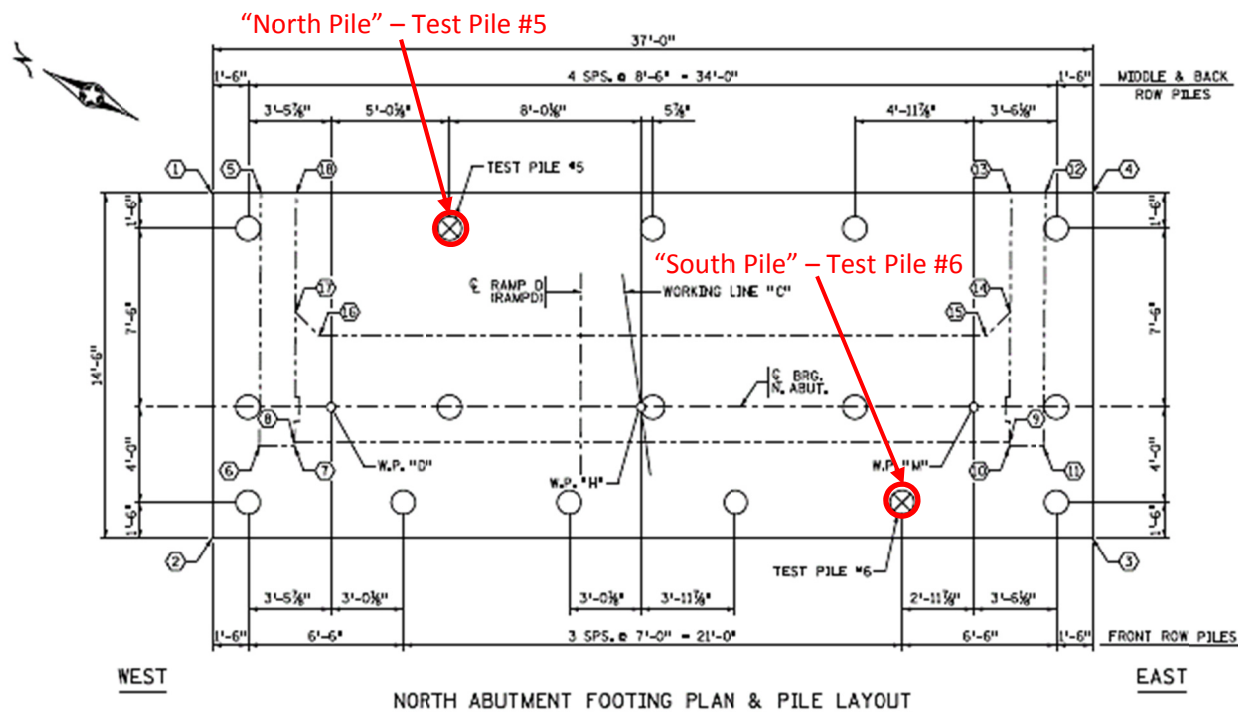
Footing plan showing the pile layout in the north abutment of BR 27V97 showing the location of instrumented piles Test Pile #5 and Test Pile #6.
